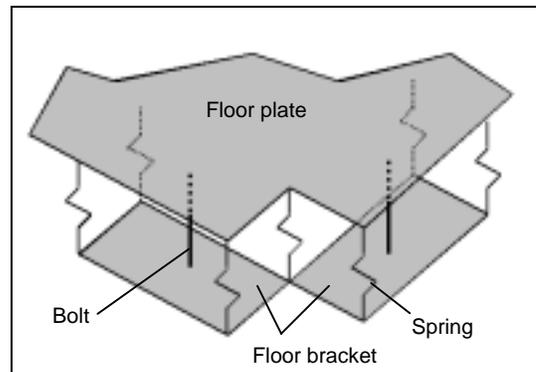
Isometric view of corner joint (with column removed) showing location of contact springs
